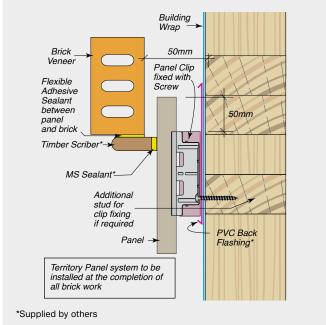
External Corner Junction Panel to Brick Veneer
